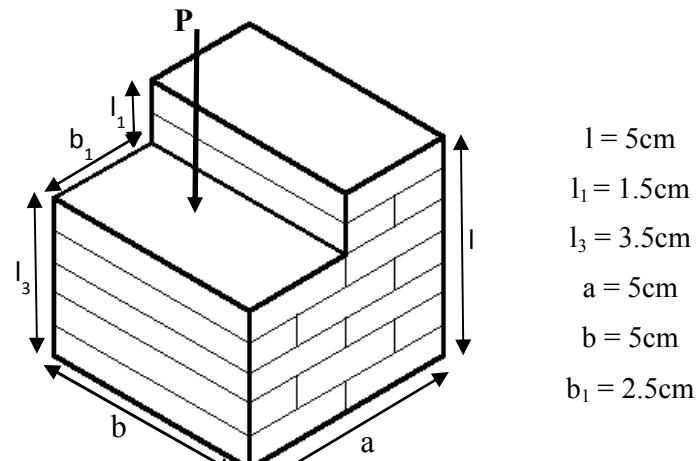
Dimensions used on test of shear perpendicular to glue line
